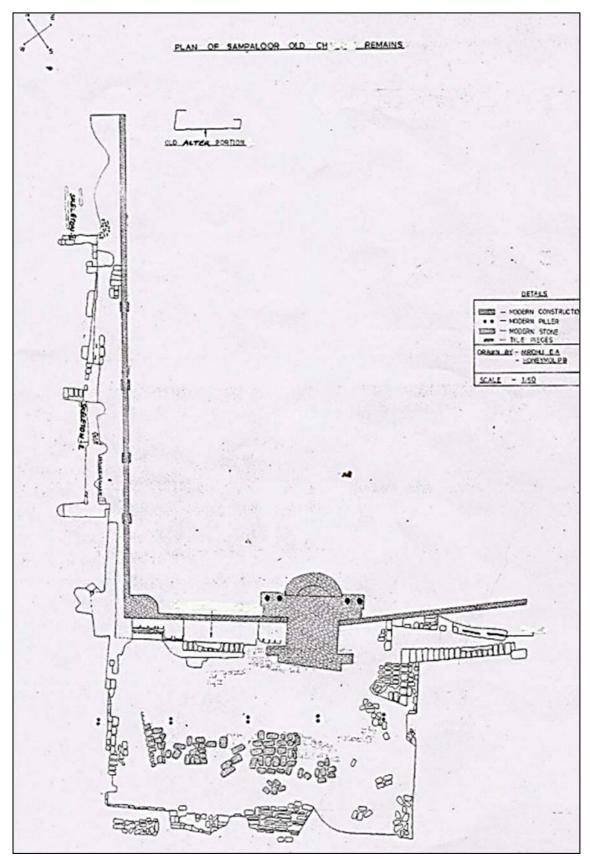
Plan of the Exposed Church Structure, Sampaloor
